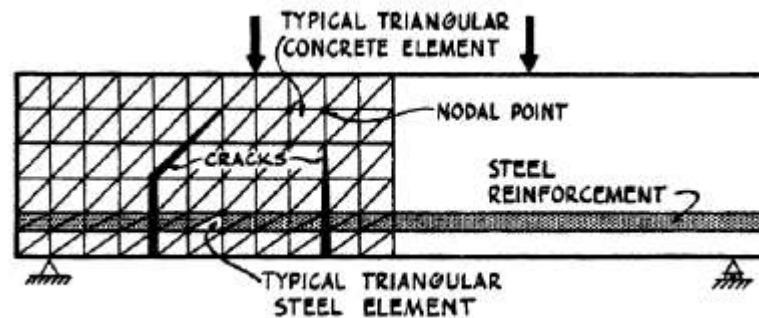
FEM of reinforced concrete beam (Ngo and Scordelis, 1967)
